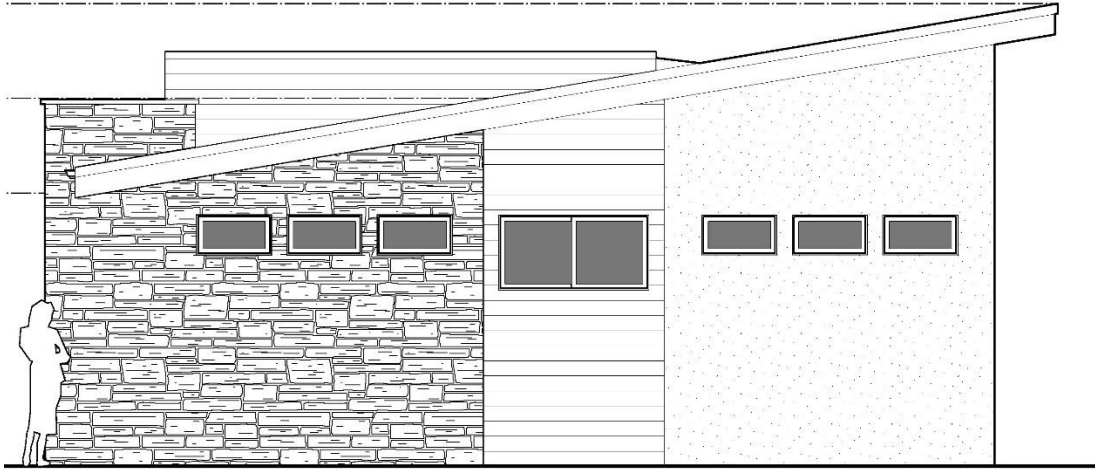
Proposed elevation of carriage house as viewed from the rear lane.
